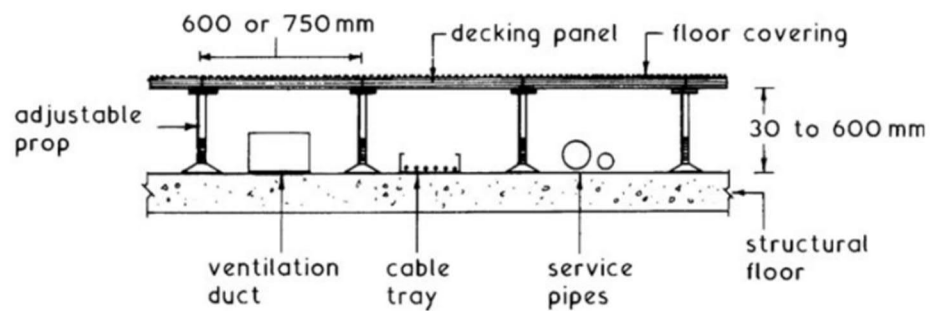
Raised access floor structure (Chudley & Greeno, 2014, p. 794)
